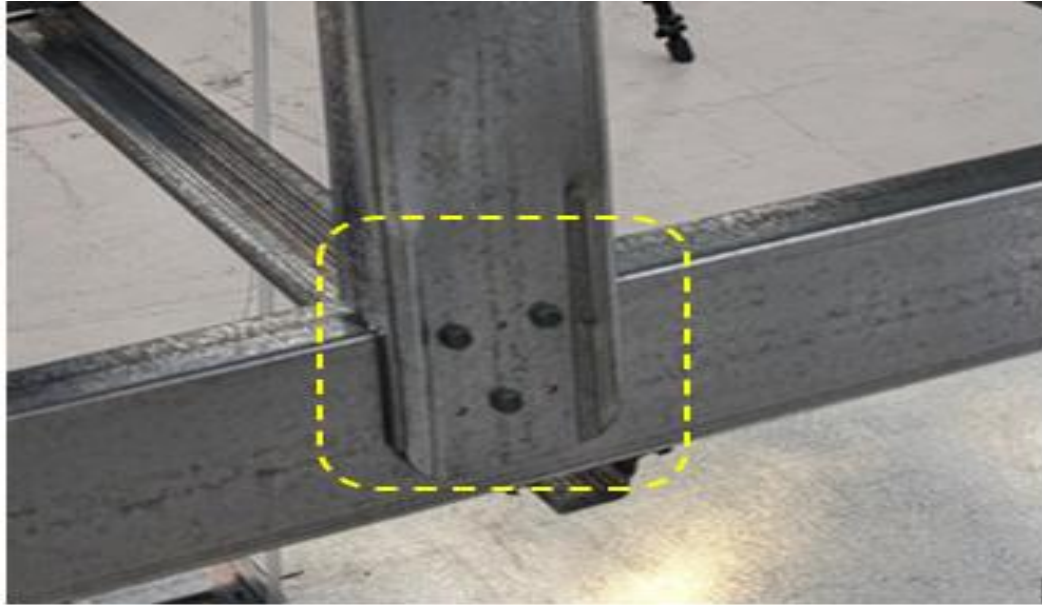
Distortional buckling failure on Truss 1 of Test 8
